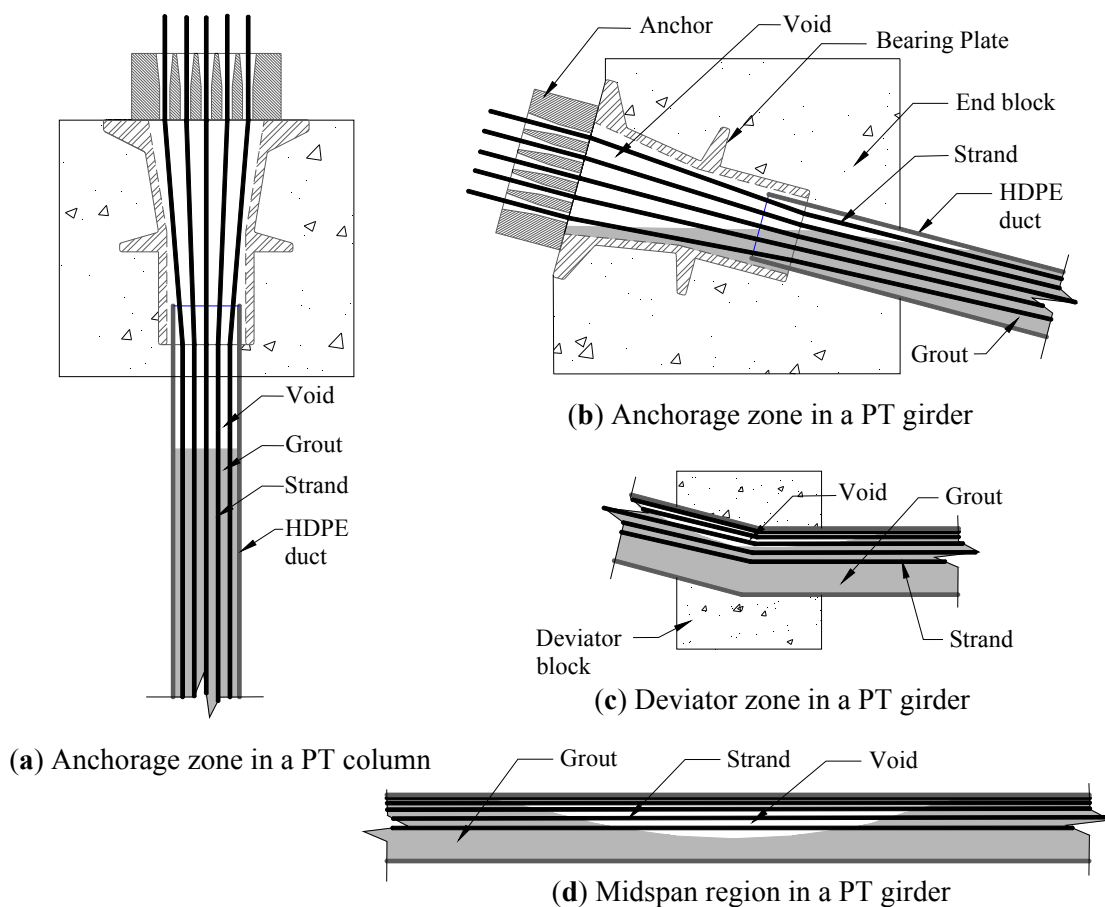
Elevations Showing Typical Void Locations in Grouted Tendon Systems.
